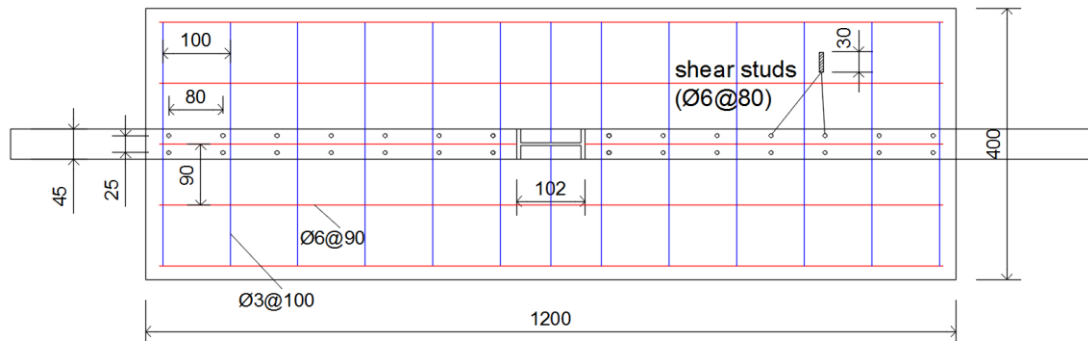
Rebars and shear studs layout of specimens B2 and B3 (Elevation view)
